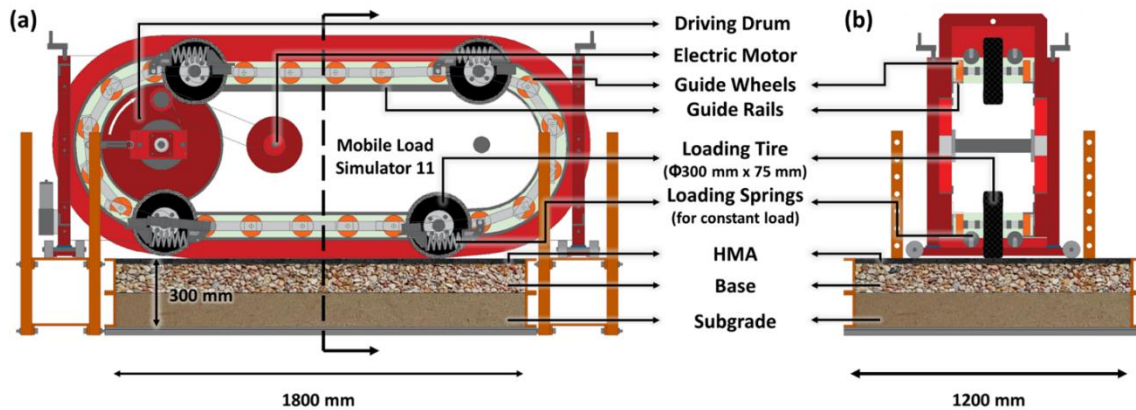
Schematic of pavement cross-section with MLS11: (a) longitudinal (b) transverse
